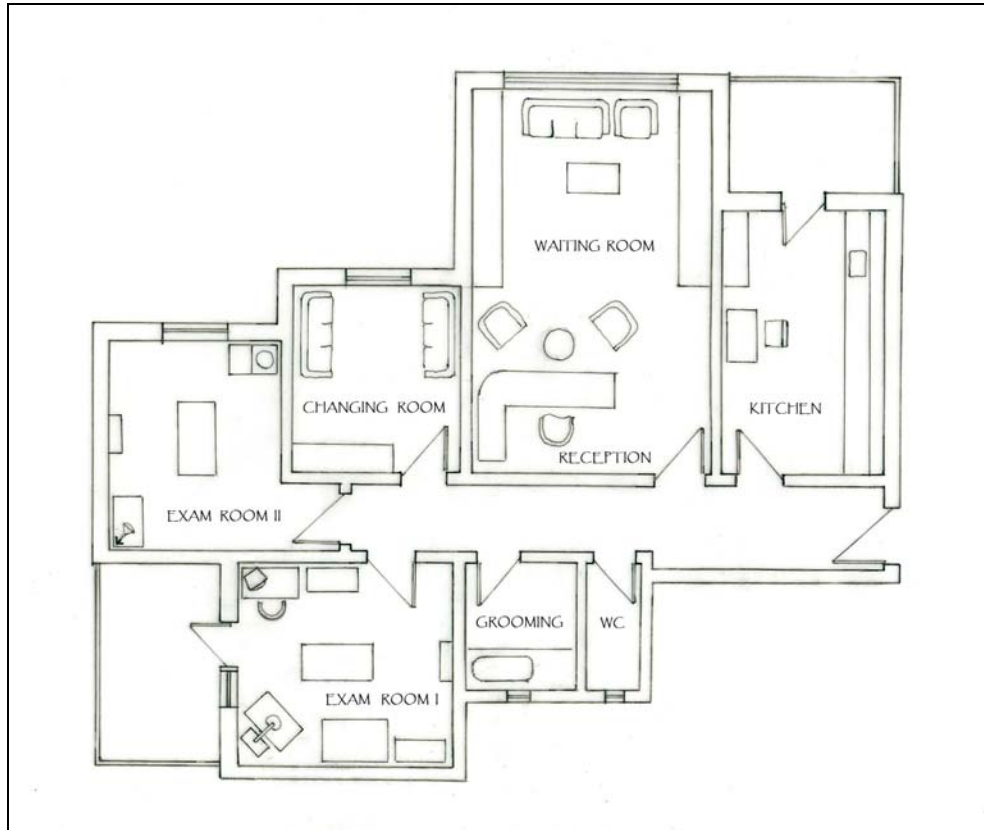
Ground Floor Plan of Çayyolu Veterinary Clinic
